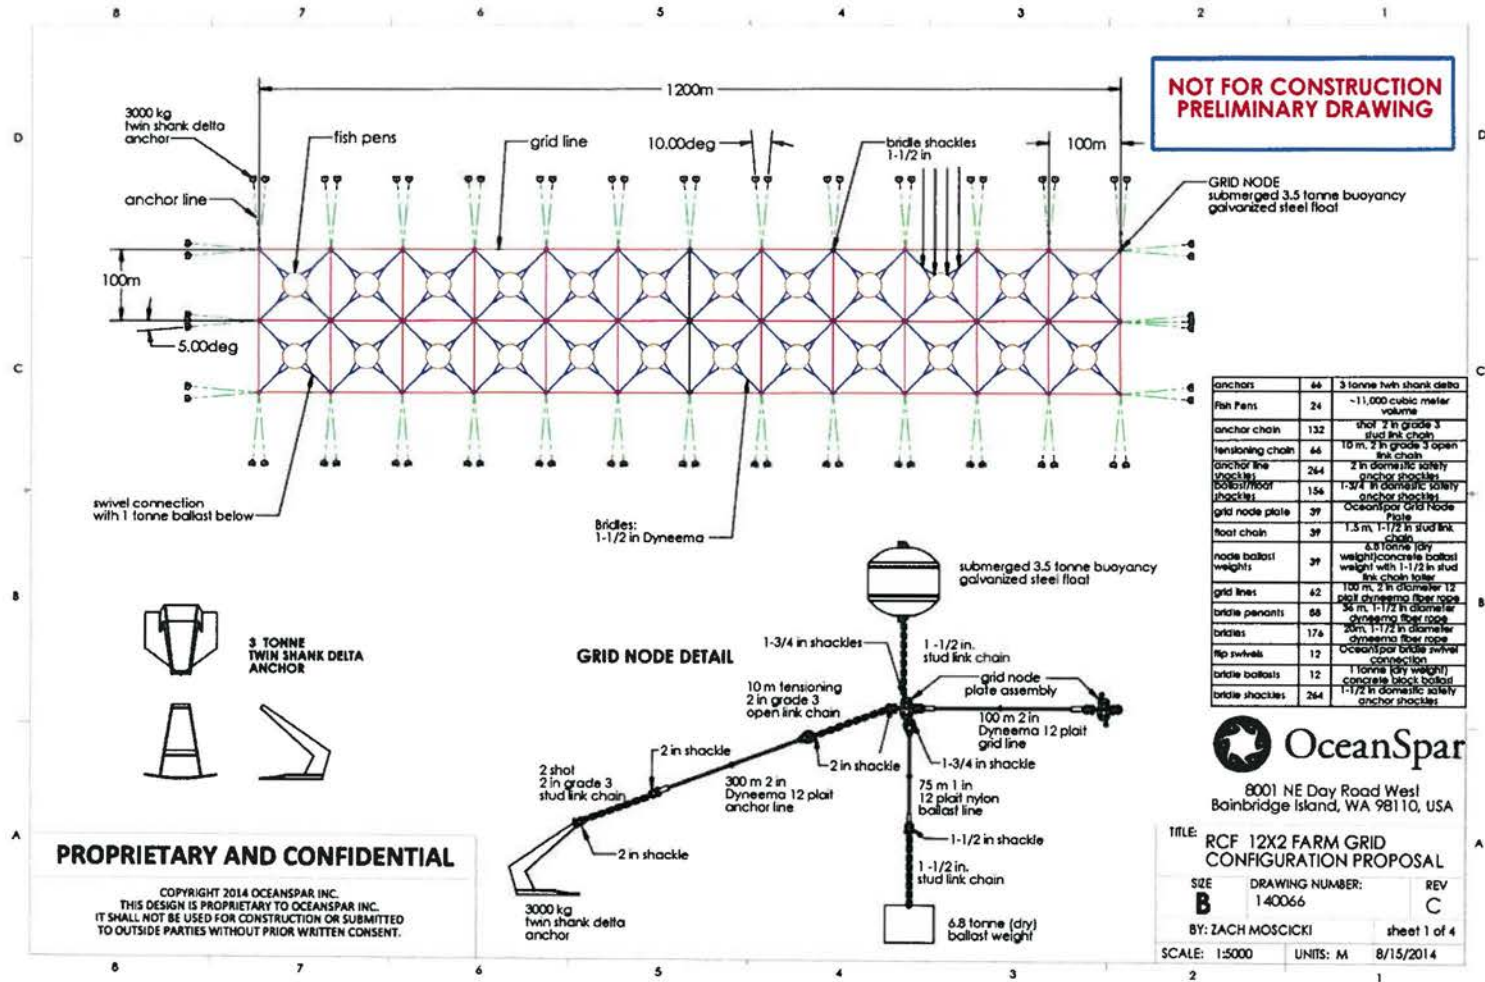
Plan and elevation view drawings of cage grid and mooring system components
